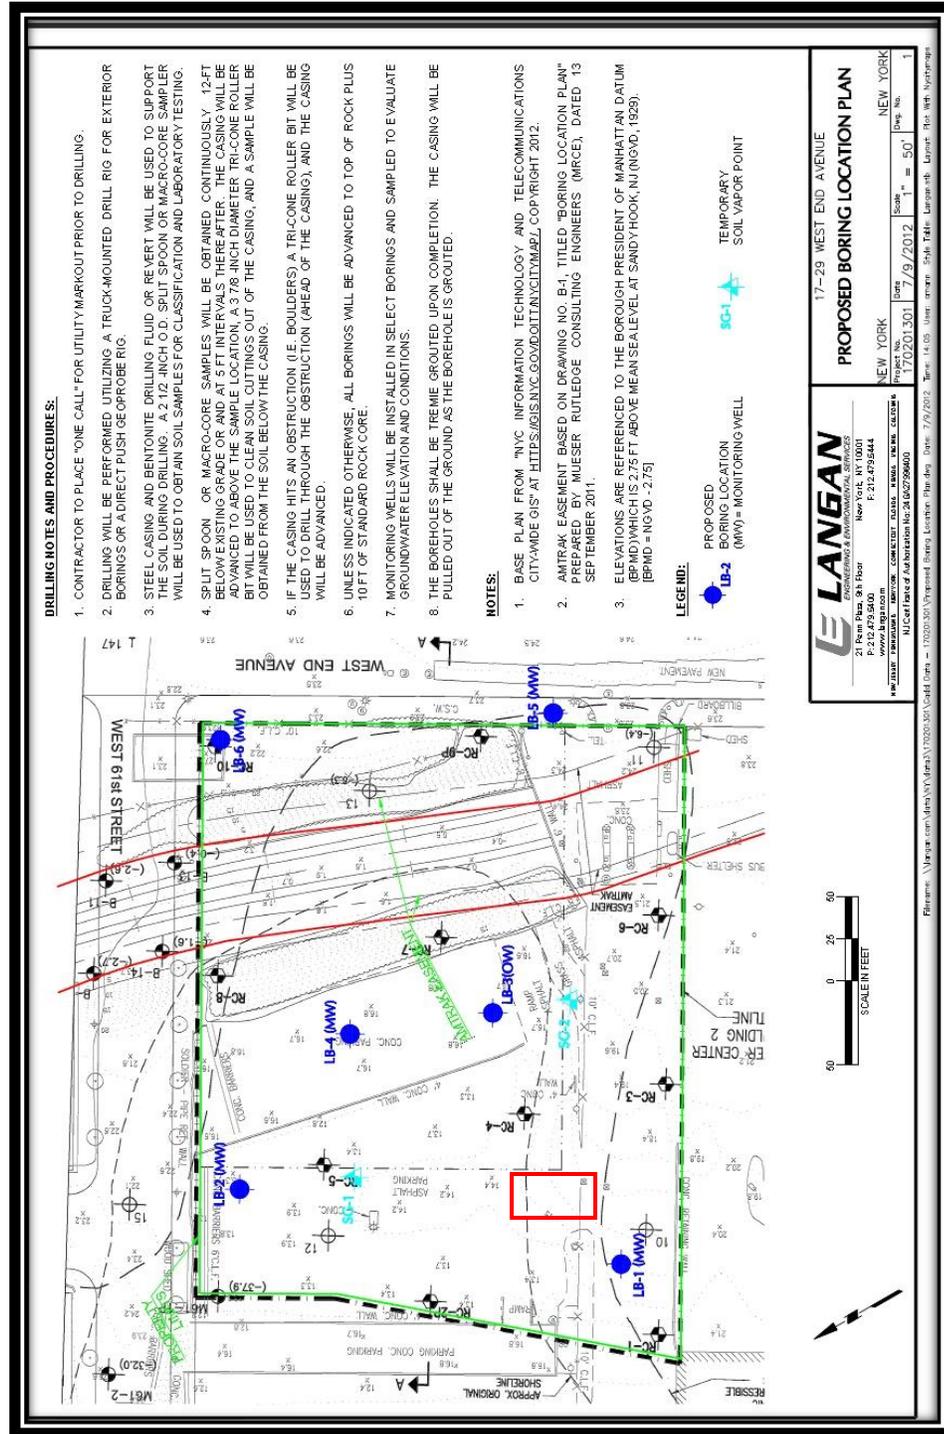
Site Plan Showing Site Footprint, Boring Locations and Grid Location Boxed In Red
